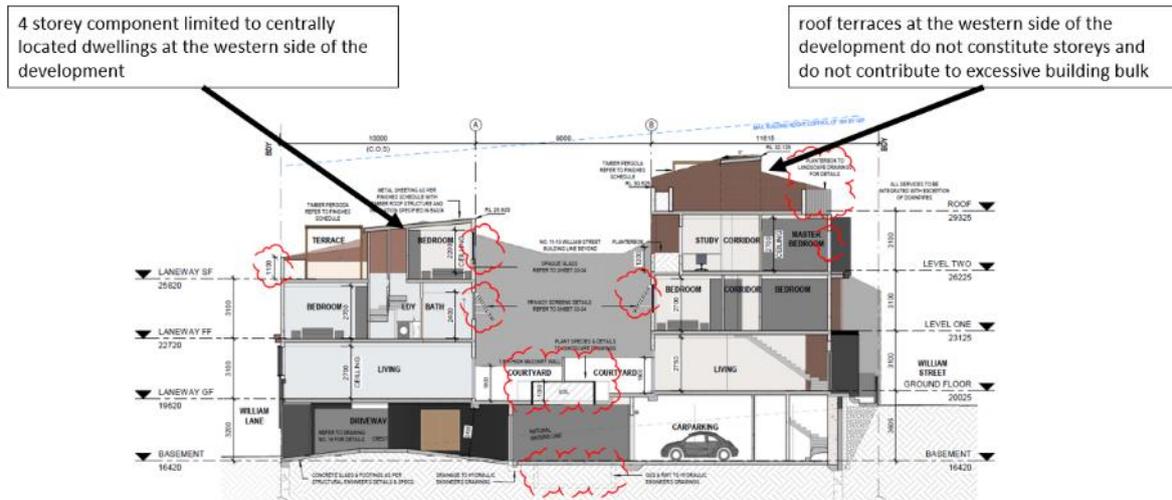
Fourth storey setback from William Lane. Roof terraces set back from William Street
